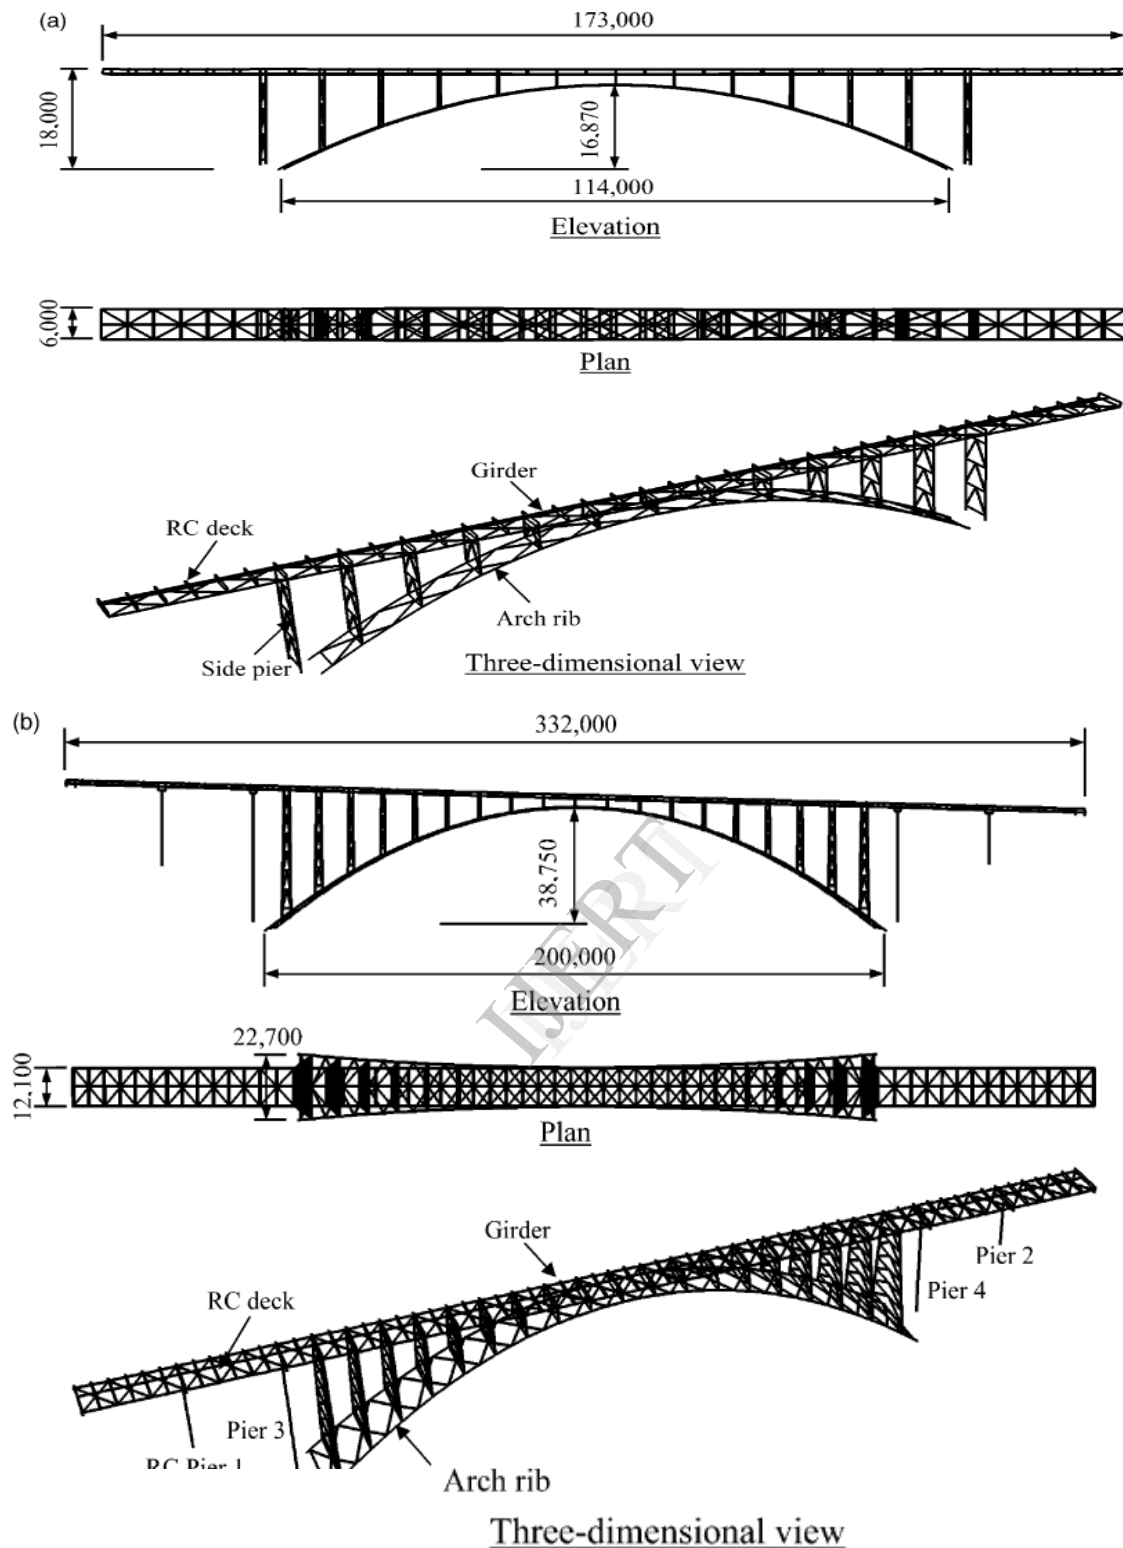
Structure models (a) Bridge I (b) Bridge II.
